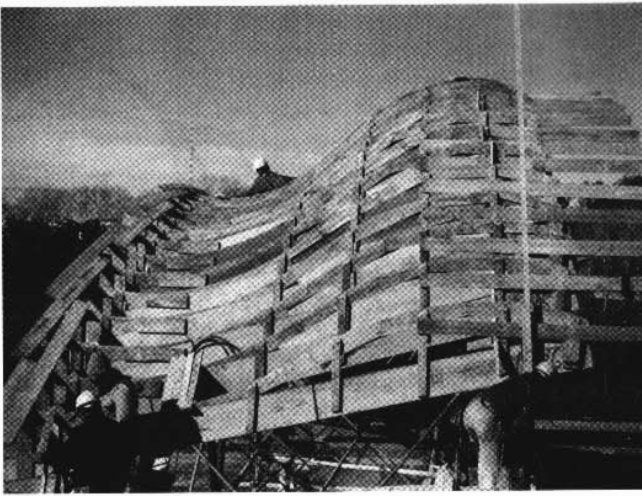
Timber ribs of the formwork, just before laying the surface planking
